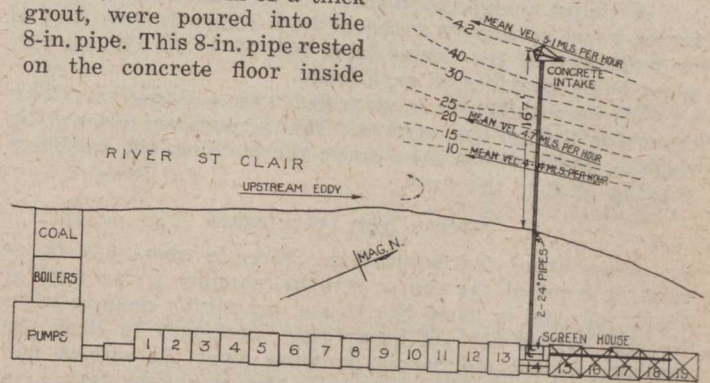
PLAN OF INFILTRATION BASINS, BUILT IN 1914, SHOWING RECENT CHANGES AND NEW INTAKE
